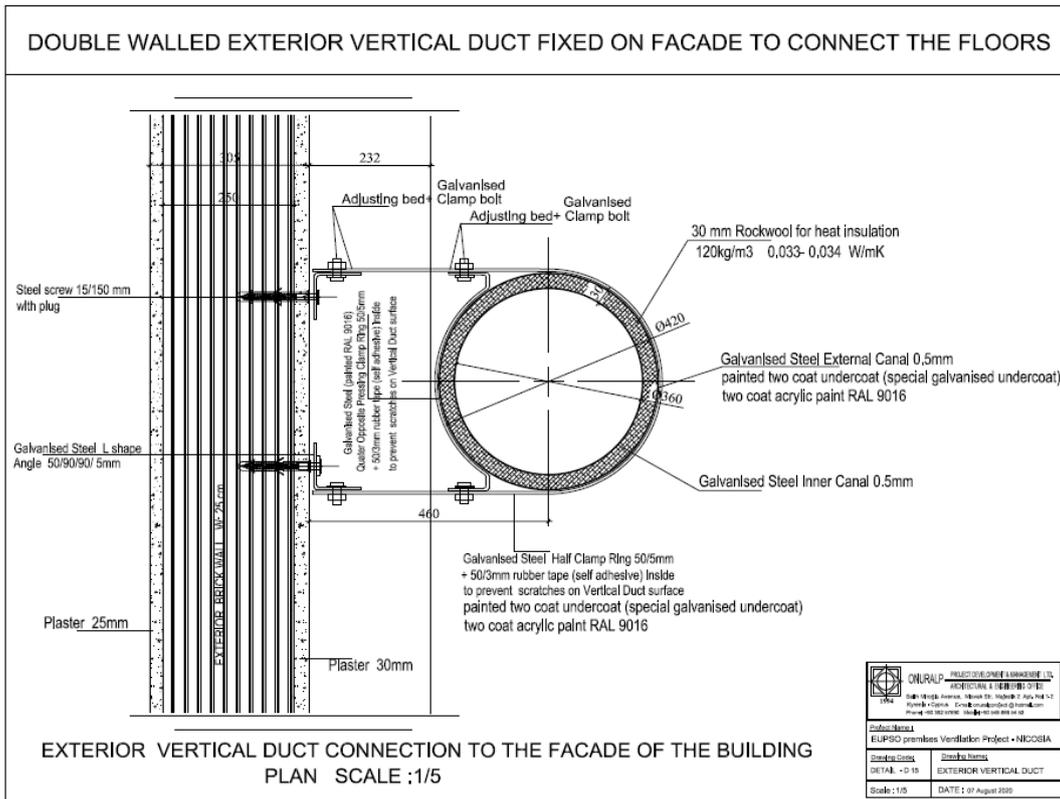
External Vertical Duct Connection to facades – EUPSO project detail no:15
